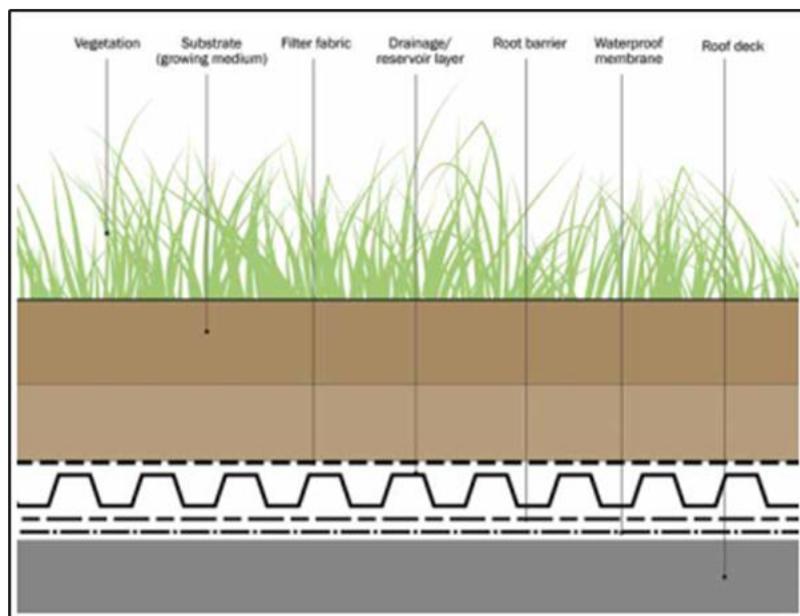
Typical Section through Extensive Green Roof (Source: CIRIA C753 SuDS Manual)
